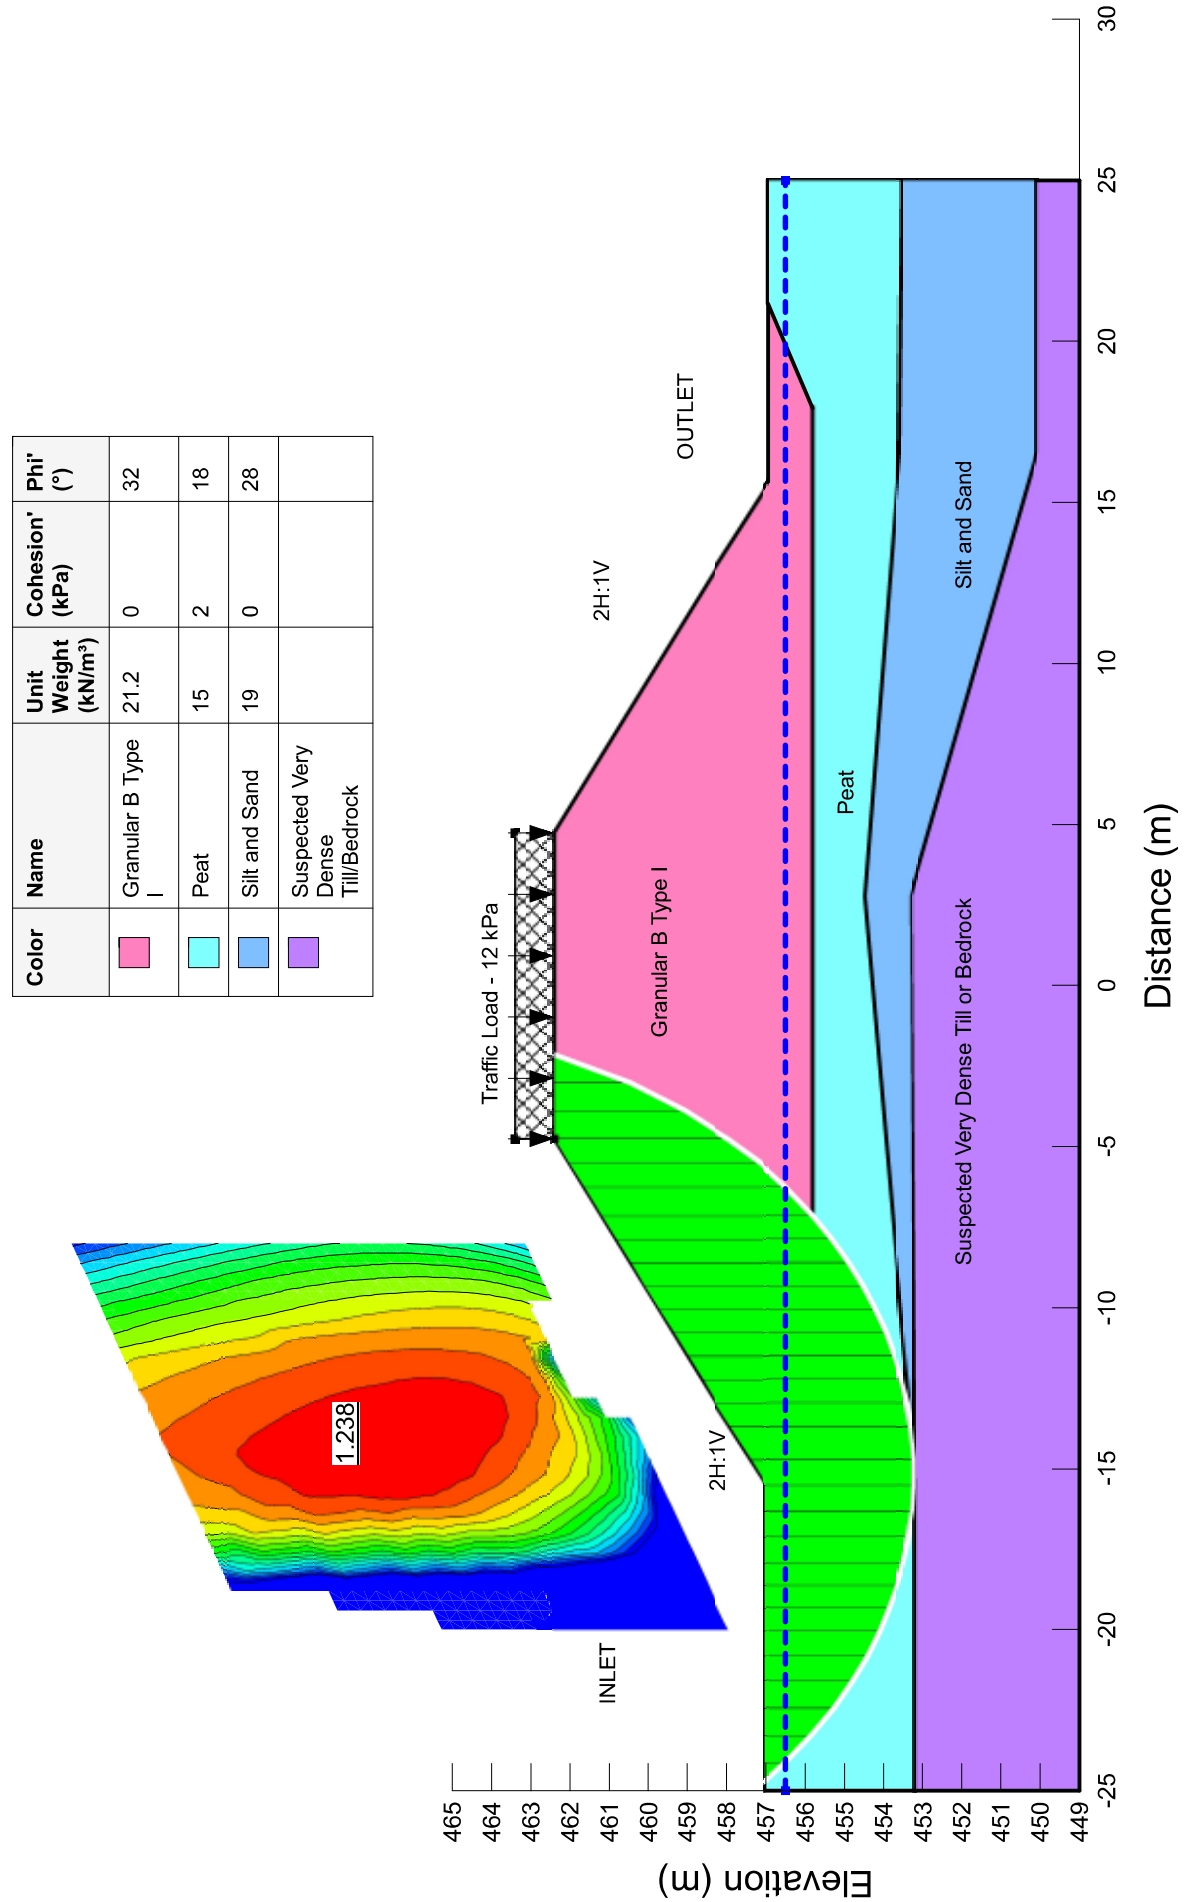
Existing Embankment Stability - Inlet Side
